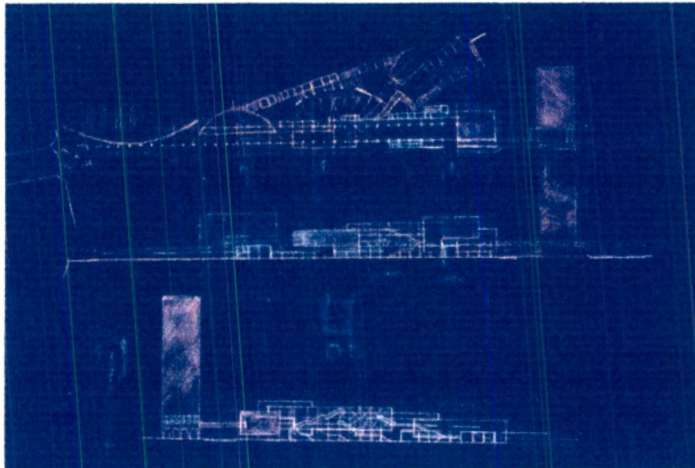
Plan and elevation (Pompidou Centre, Paris)
